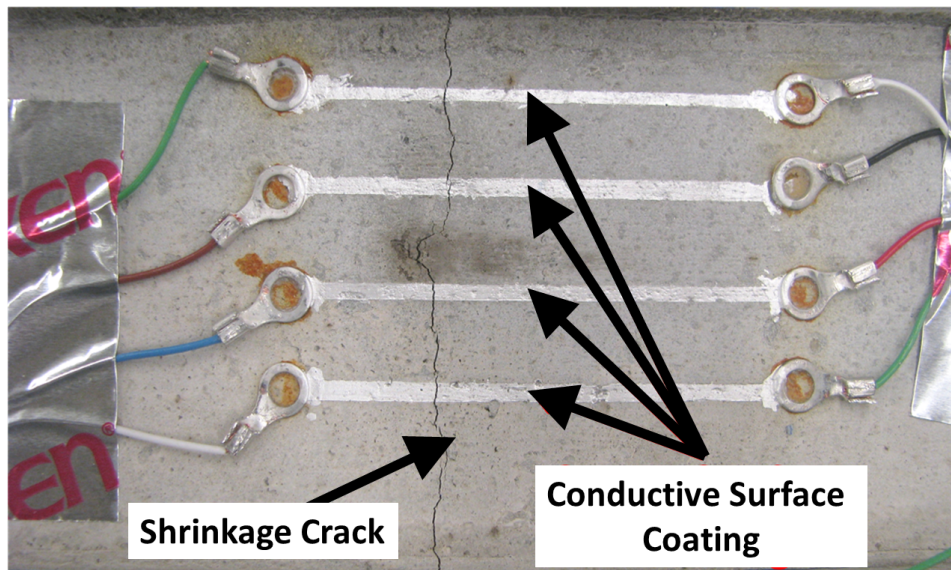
A typical picture of a cracked slab at the mid-span (at the notch location). The four strips of conductive surface coating and their electrical connections are also shown.
